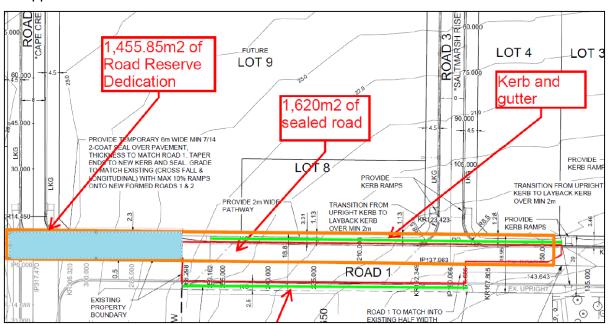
Ineligible Road Component (Source of original plan: Allen Price & Scarratts)
